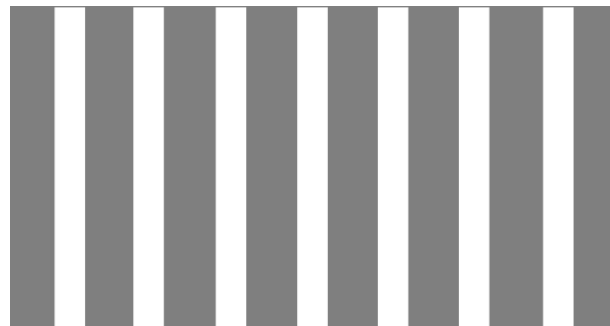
Shape 6, Bar Shape of the Road Hump Marking.
